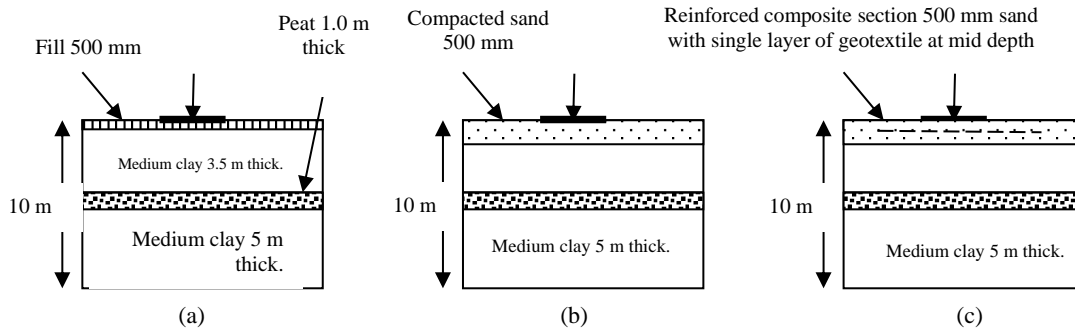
Plate load test for different cases in the field, a: load test on normal ground above the fill, b: load test on stabilized ground above the peat using 500mm compacted fill without reinforcement, c: load test on stabilized ground above the peat using 50.
